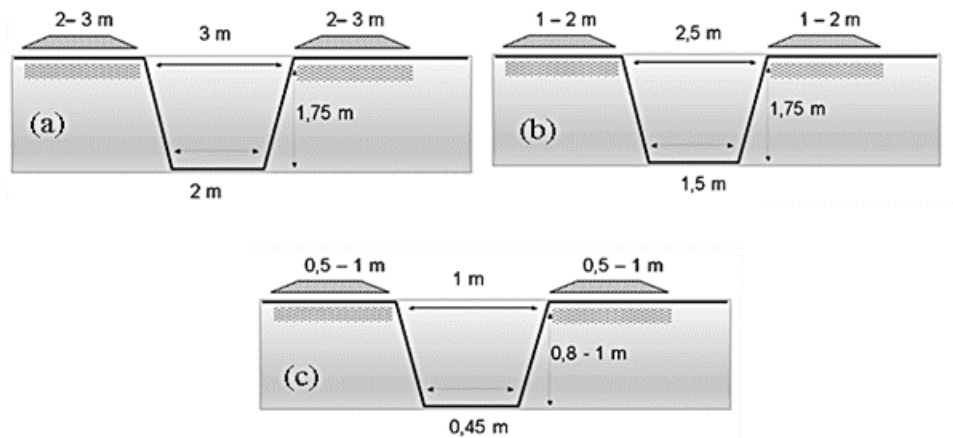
Dimension of drains in the surroundings of embankment areas (a) main drains, (b) collection drains and (c) field drains (in-field drains)
